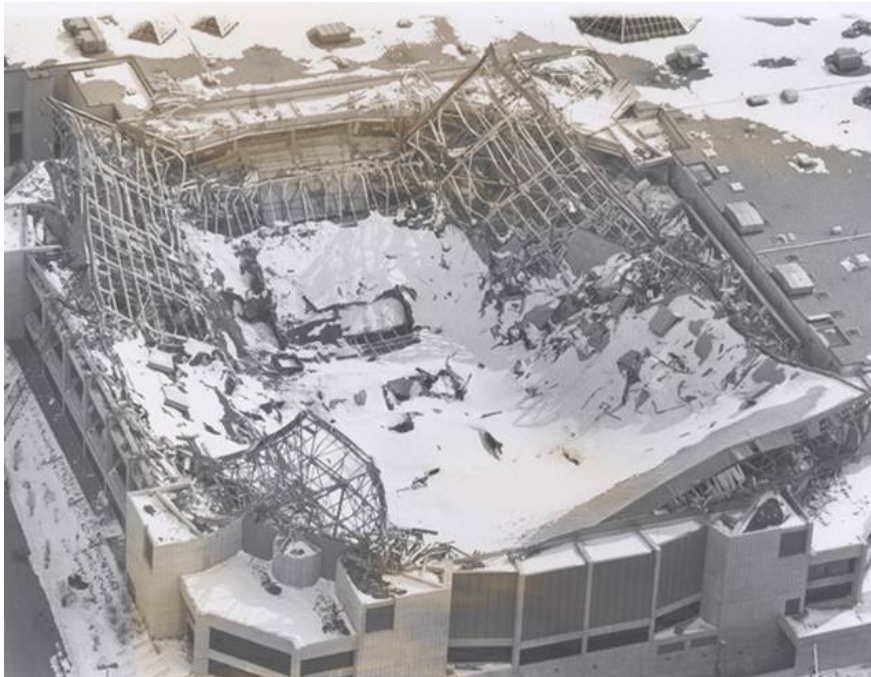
Roof collapse in 1978 in Hartford, Connecticut
